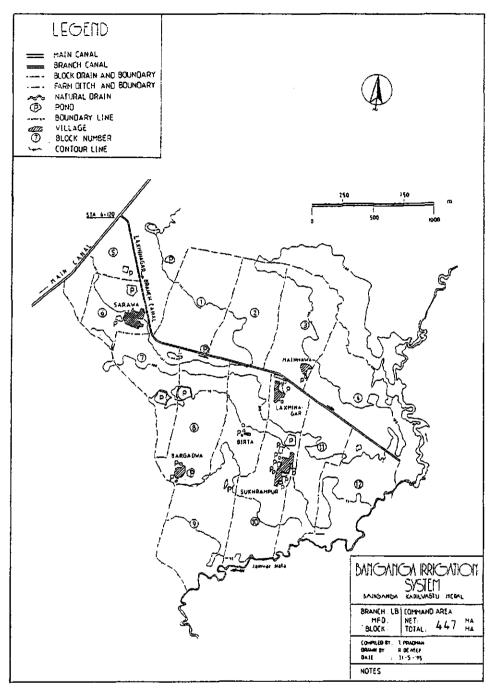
Plan of Laxminagar Branch Canal showing the tertiary blocks served, ponds and villages (Source: DOI/CAD Project drawings, 1989.)
